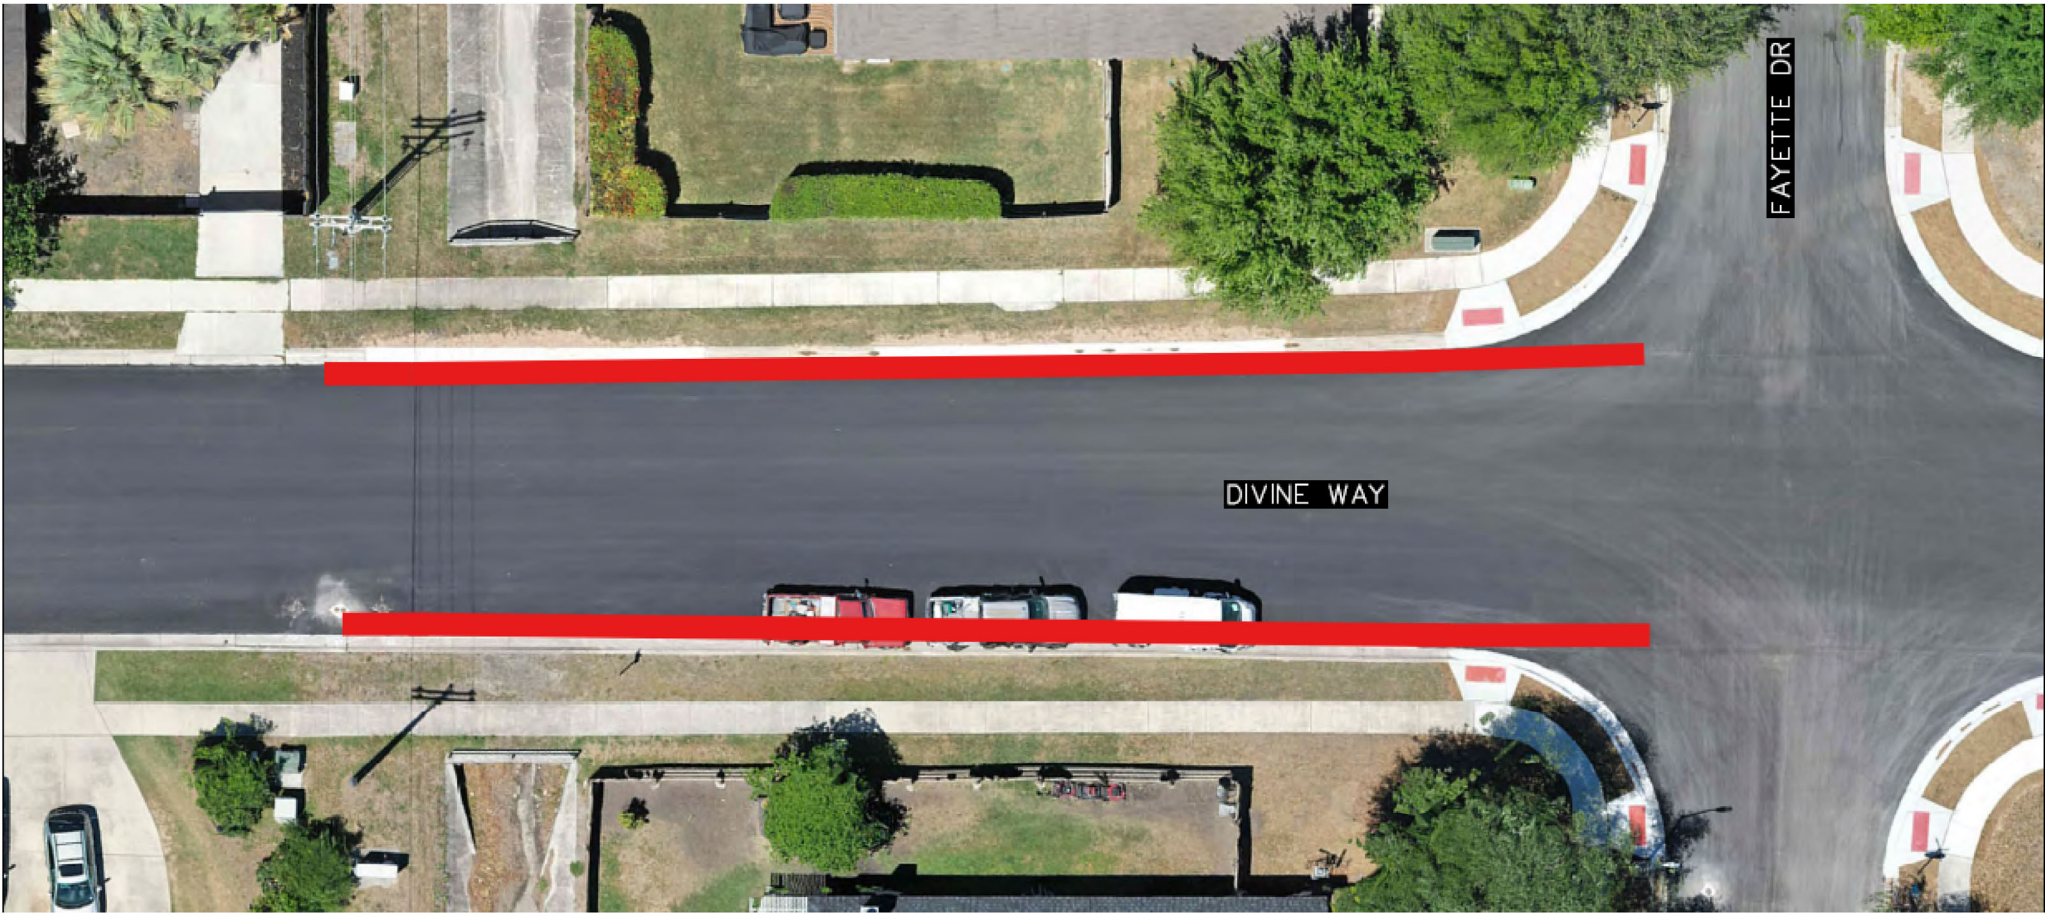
Current, improved pavement and ADA ramps at the subject intersection following the 2023 Bond Citywide Street Improvements project.
